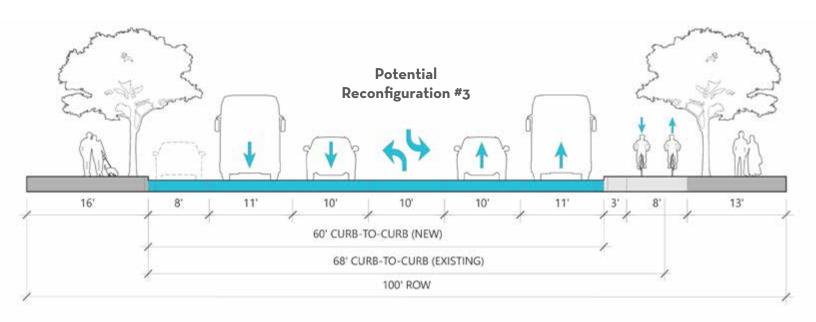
Potential Reconfiguration #3: Two-Way, Sidewalk-Level, Class IV Bikeway along an Arterial Street.
